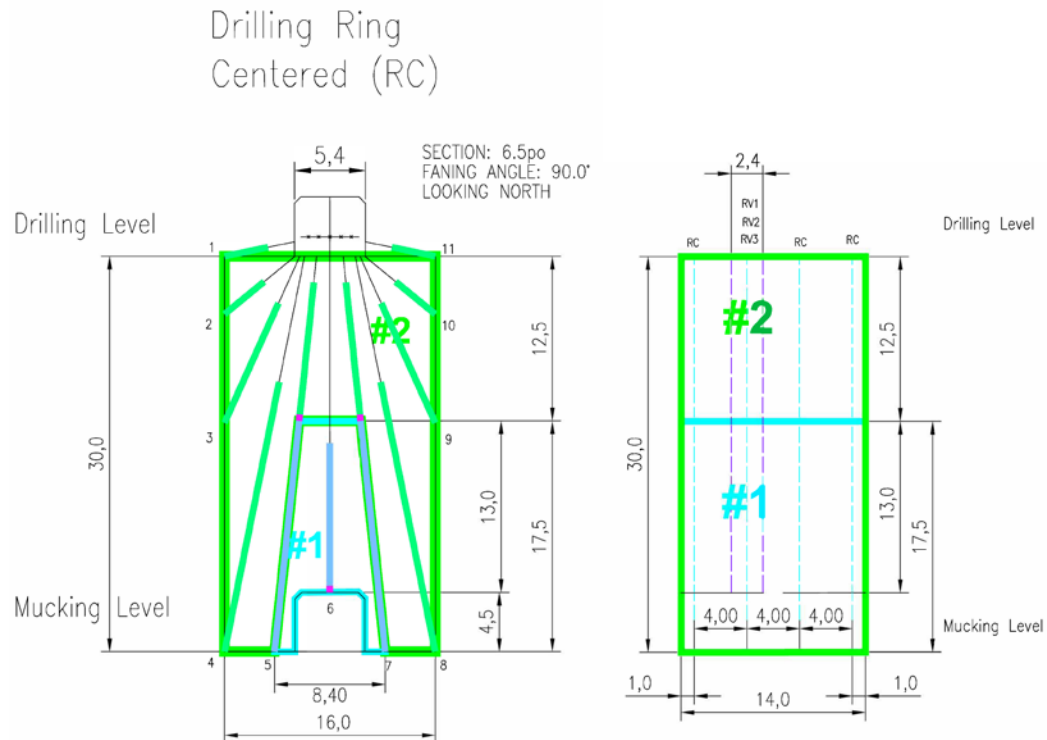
Typical drilling and blasting pattern for levels L1910 to L2060
